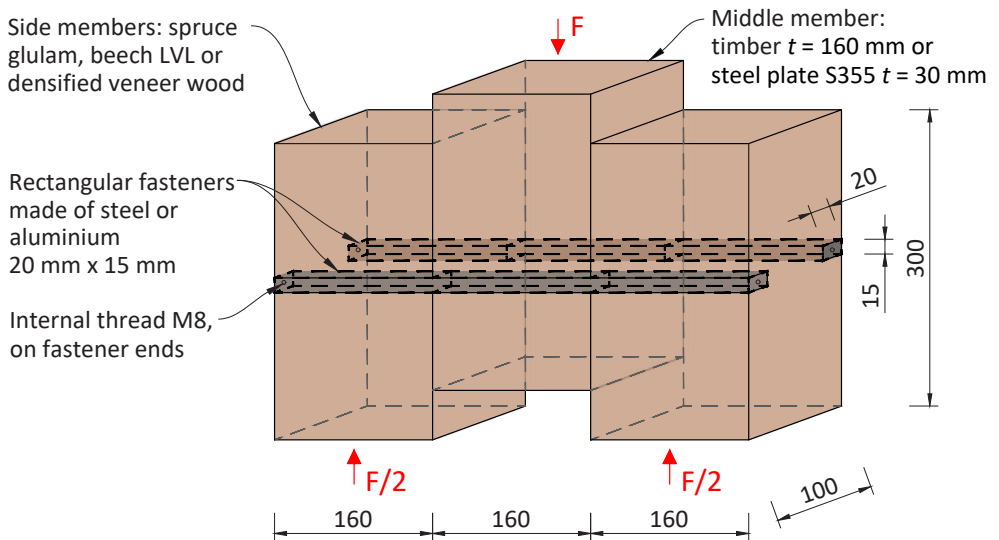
Scheme of test specimen of an exemplary timber-to-timber connection with external rectangular fasteners, in mm.
